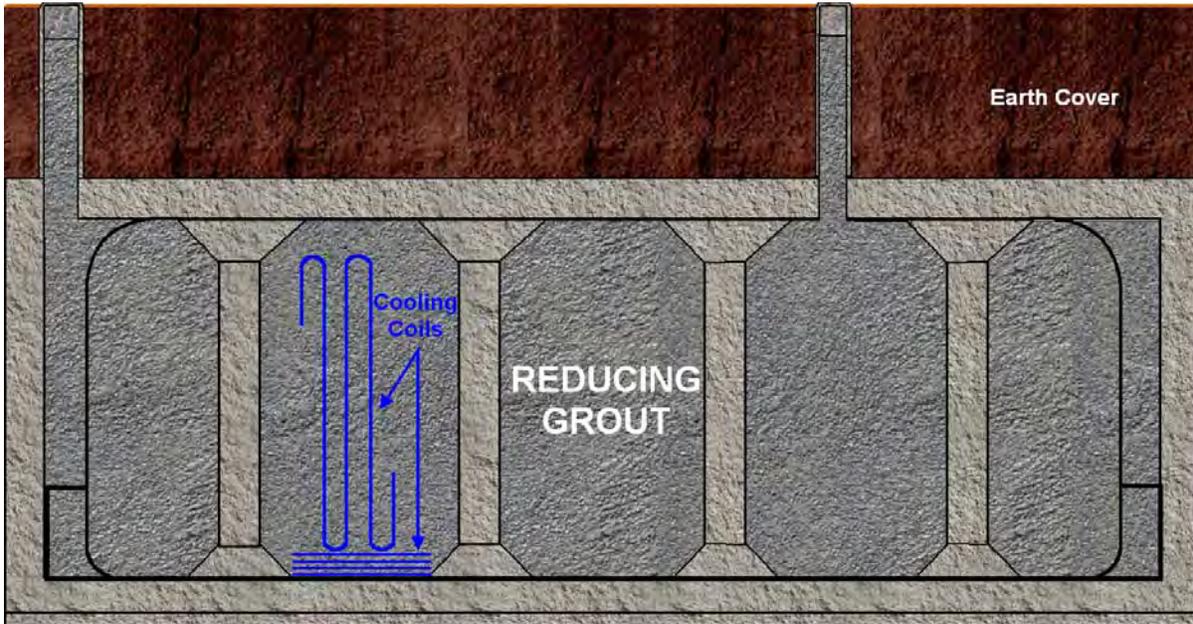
Typical Type II Tank Grouting Configuration
